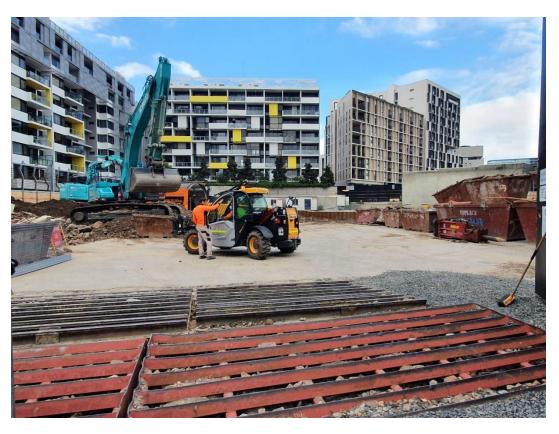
View of subject site with existing buildings being demolished and currently a construction site. View also shows the northern elevation of 15 Joynton Avenue and 6 Kingsborough Way and the western elevation of 17 Joynton Avenue.
